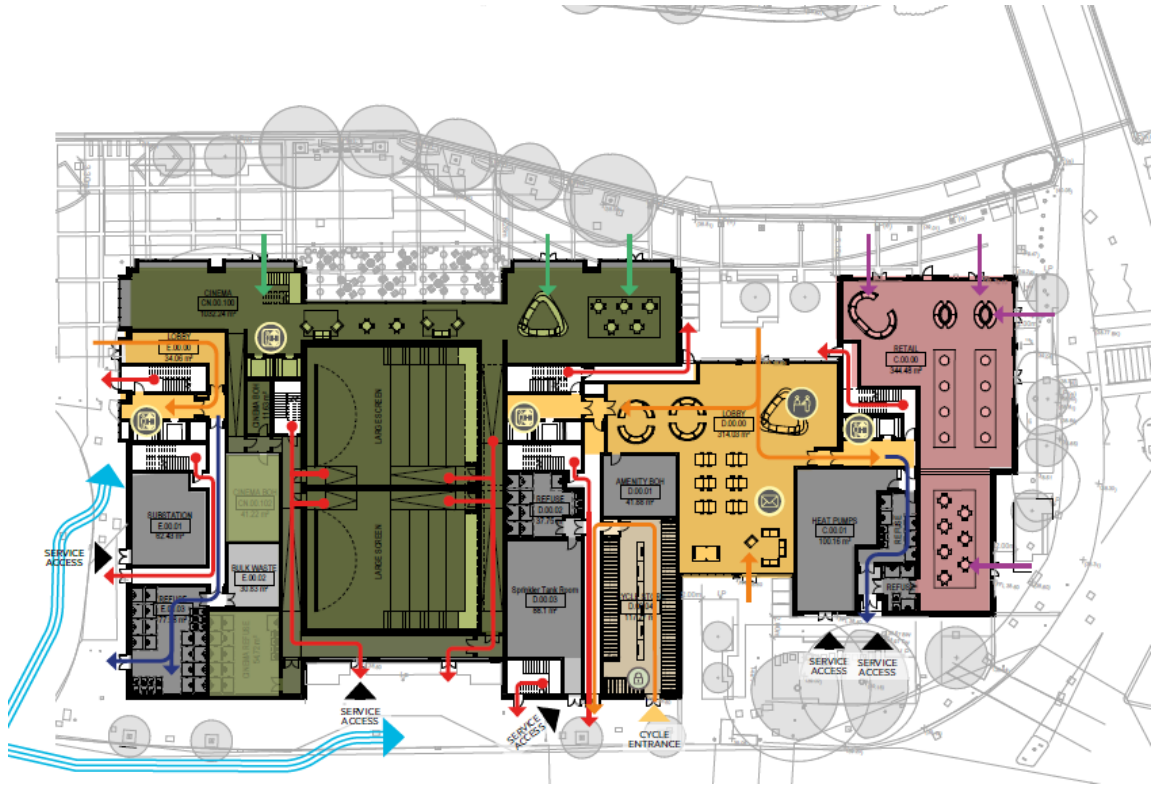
YHP2 – Proposed ground floor plan showing access to the building
